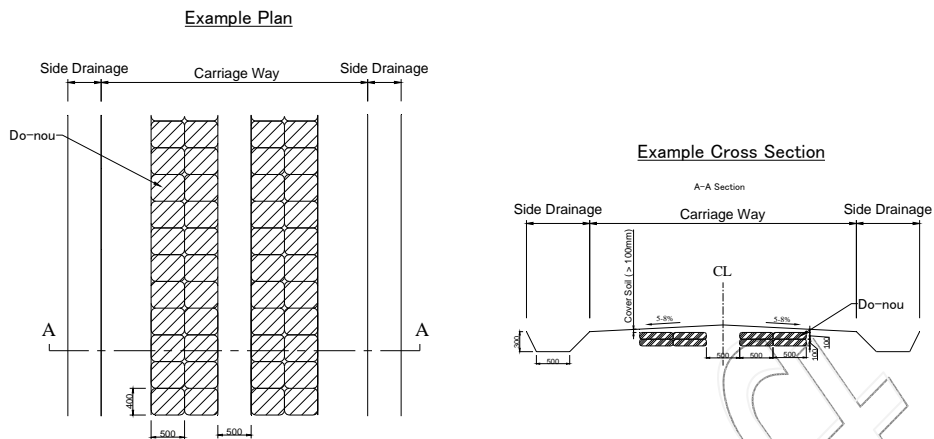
Example of Plan and Cross Section of Do-Nou Method
